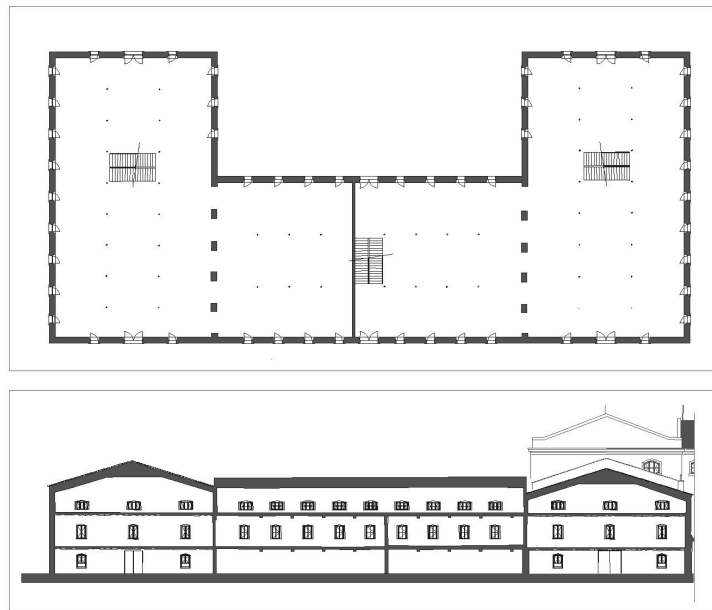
The Plan Layout and Section of “U” Shaped Building (Building number 7)
